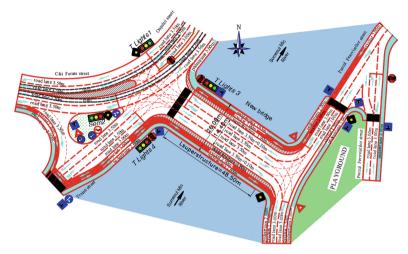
Plan view of the Bridge with four carriage-lanes [1].
